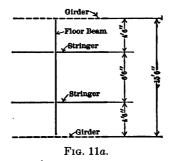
is a line drawing of a plan showing the relative position of girders, floorbeams, and stringers. A load on any stringer is carried first to the floorbeams at its ends. The floorbeam carries it to the girders and the girders to the abutments or other end supports.
